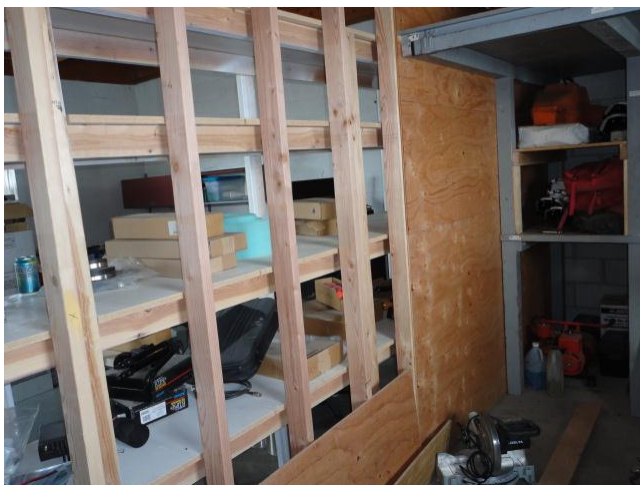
Timber Shop - Install two (2) recessed duplex outlets in the open stud wall as shown on drawing.
